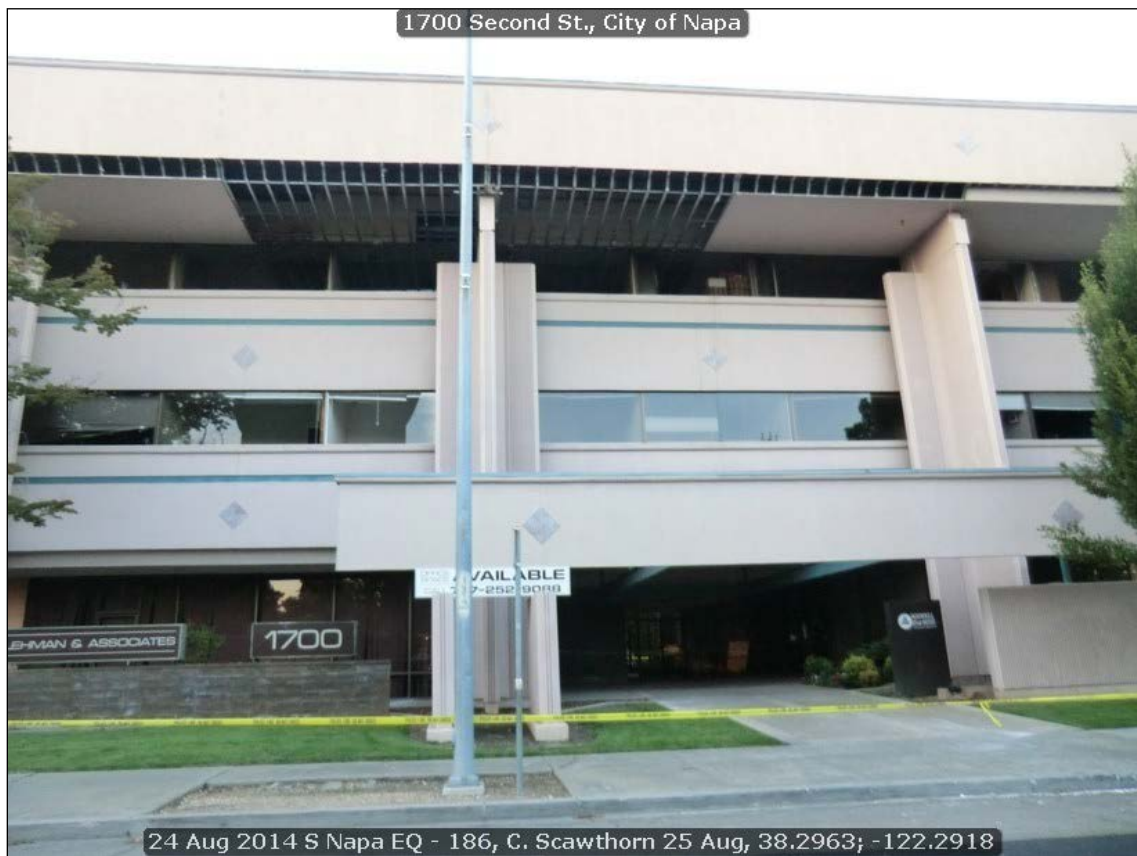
Office building 1700 Second Street, built 1984, damage to third floor exterior soffit
